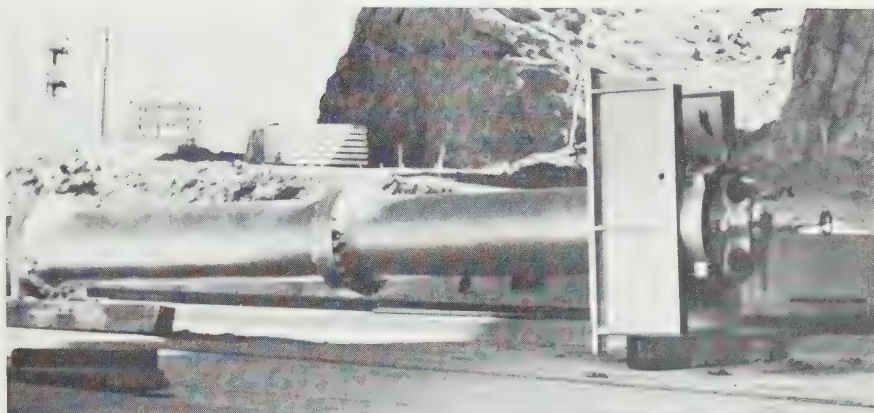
Hydraulic hoist for 13.96- by 22.45-ft penstock intake gate at Glen Canyon Dam in Arizona.
